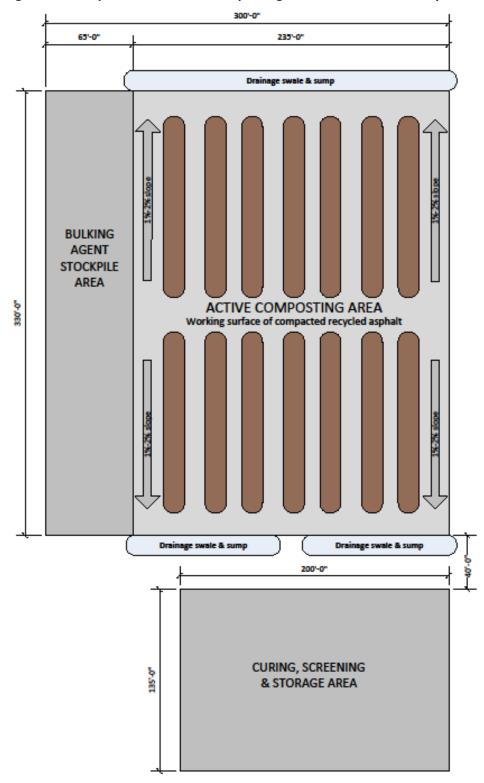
Conceptual Site Plan for Composting Pilot at Southeast County Landfill
